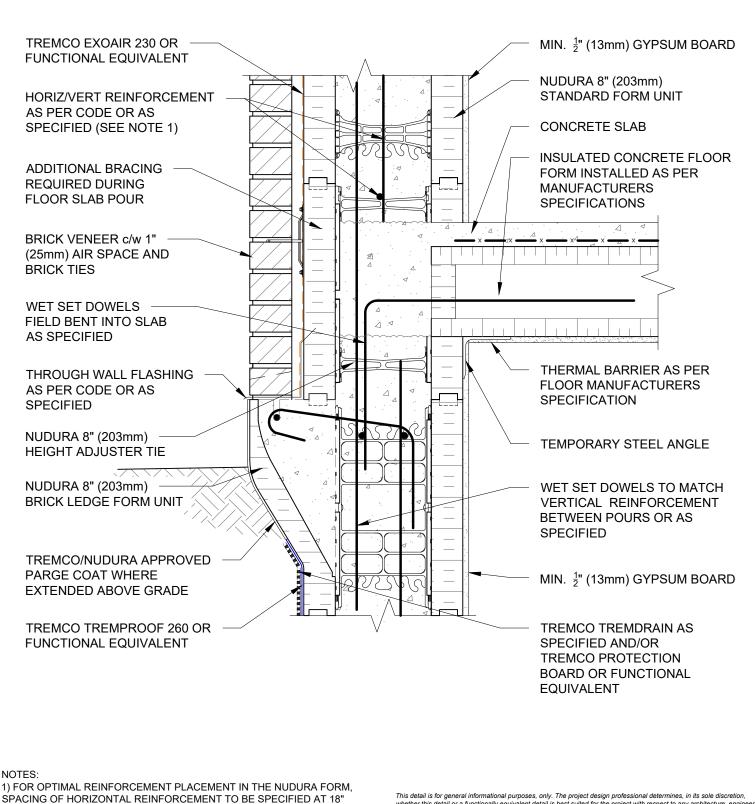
" (203mm) Form Unit, ICFS Connection, ICFS Resting on Form, Exterior Side Wall at Grade, Brick Veneer Finish
